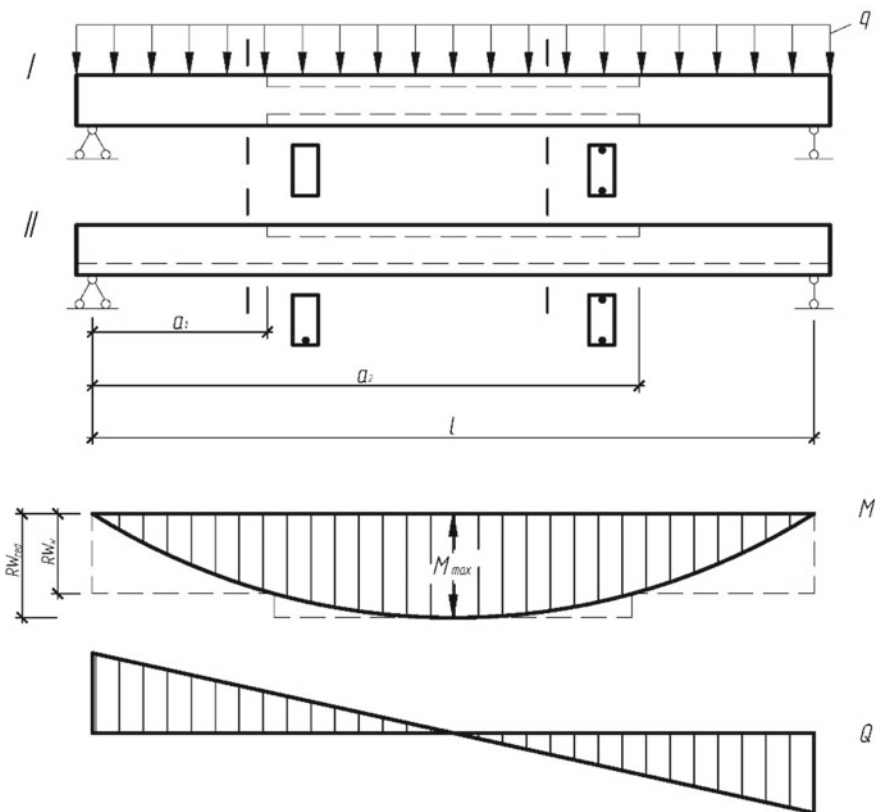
Diagrams M, Q and circuit breakage theoretical reinforcement girders
